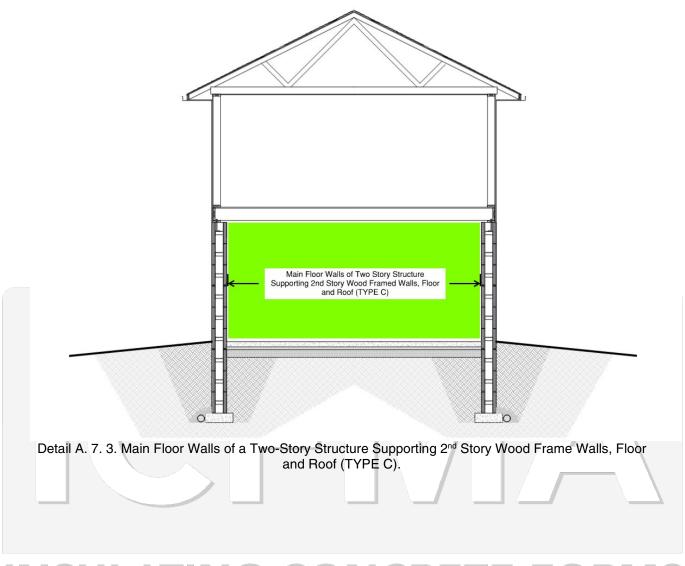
Wall Configurations in a Building Without Walkout Basement
